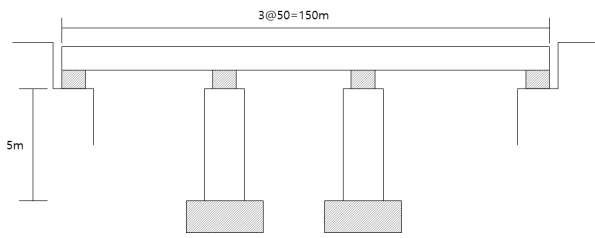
Geometric details of composite steel-concrete box girder bridge
